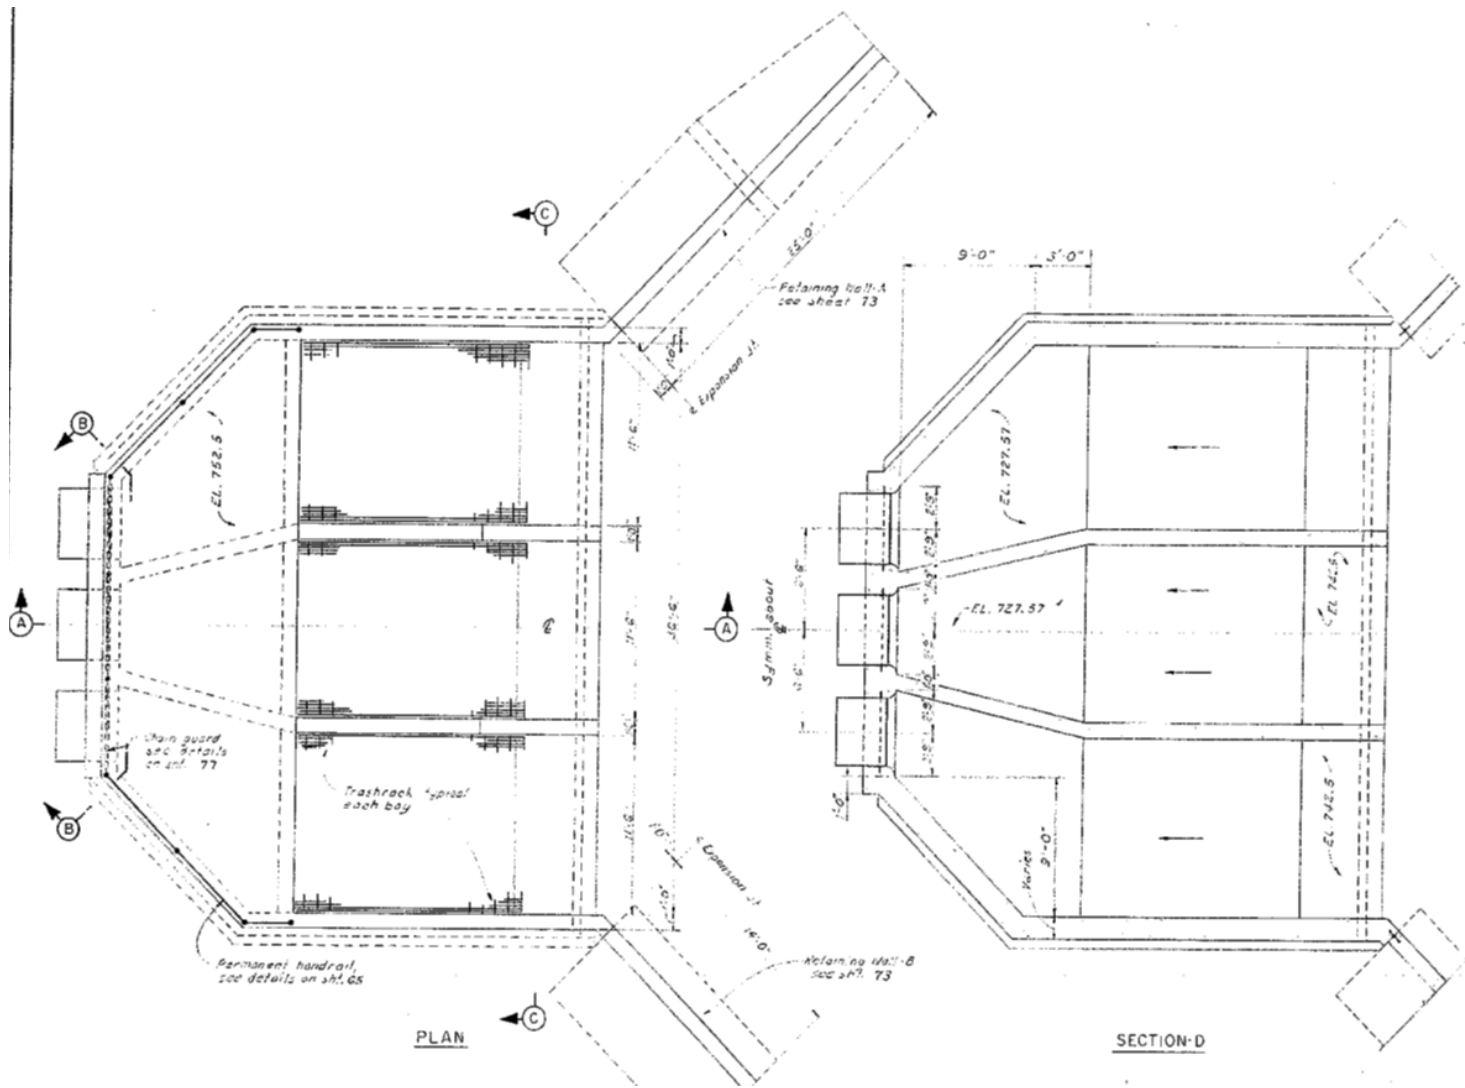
Plan View of the Area 380 Structure Outlet Showing Three Separated Bays.
